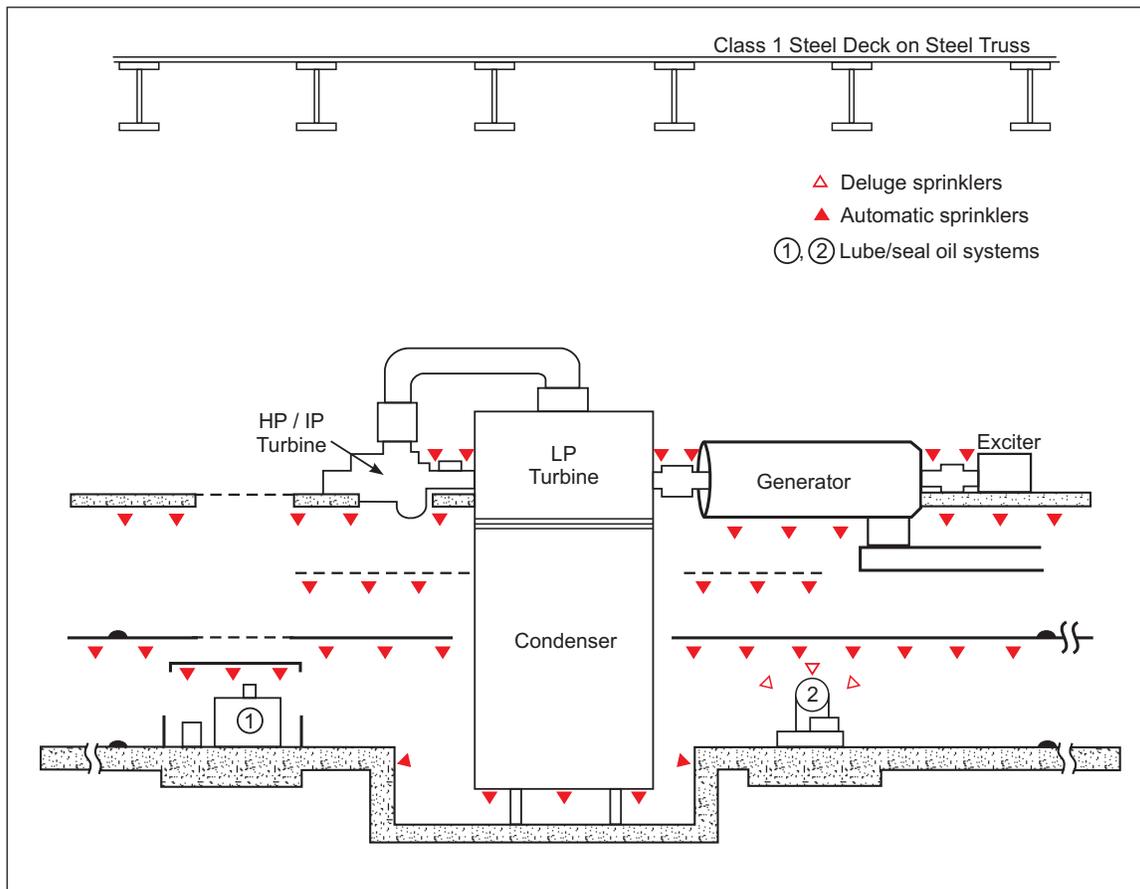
Protection for medium size turbine generator with floor openings near mineral oil systems needing spray fire protection
